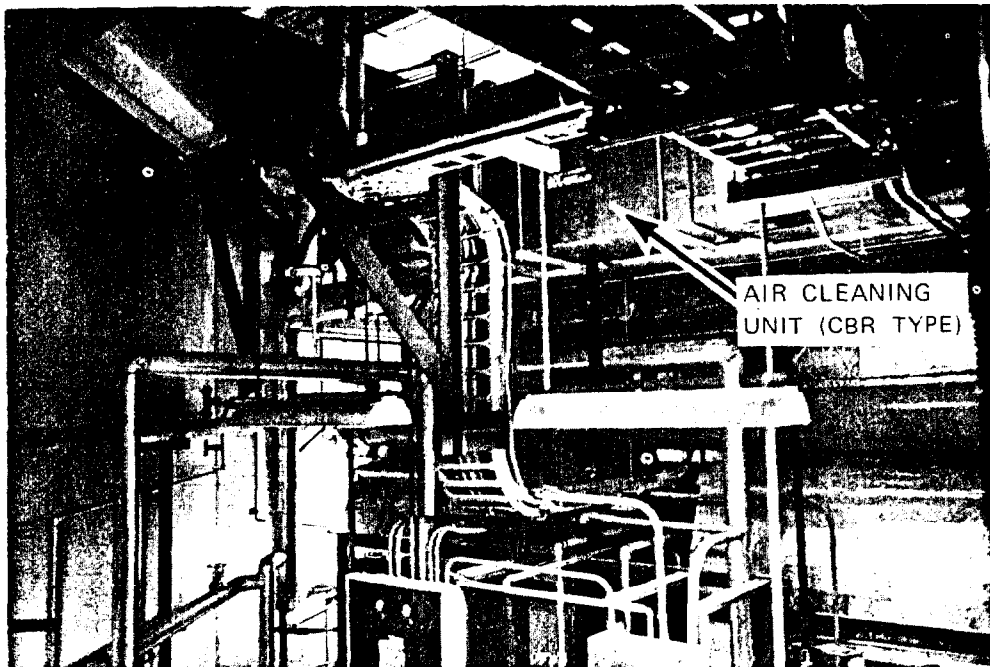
An illustration of poor filter installation practice. Arrow points to wood-cased CBR filter. Light troffer indicates that height above floor is about 20 ft, requiring that ladders be brought in to gain access to the unit. Note cable tray, hangers, piping, and other obstructions.
